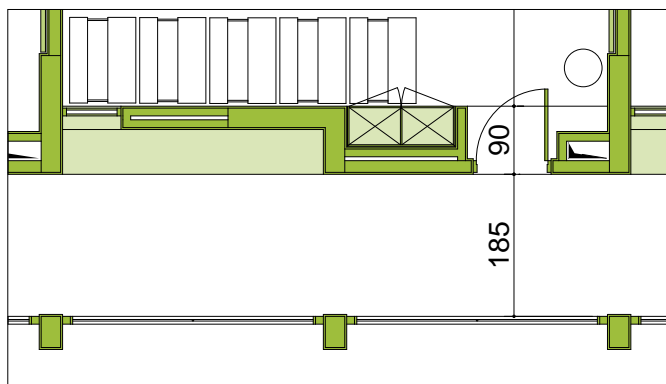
PU's third system of classroom wall (Sahanaya School Extensions)
